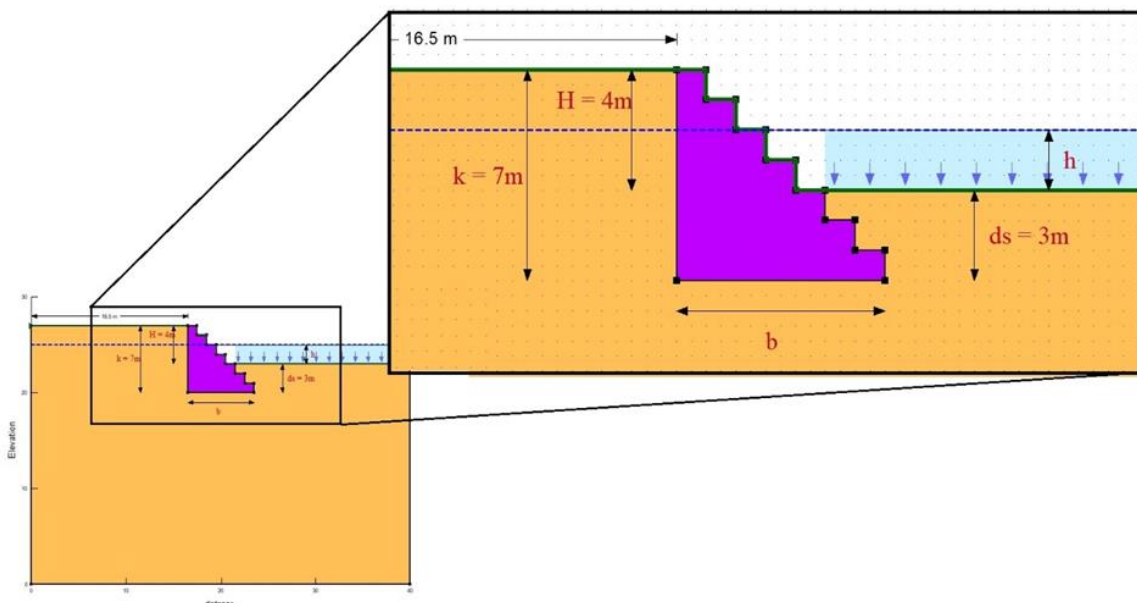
Transverse profile of retaining wall (gabion and concrete) to protect the river banks
